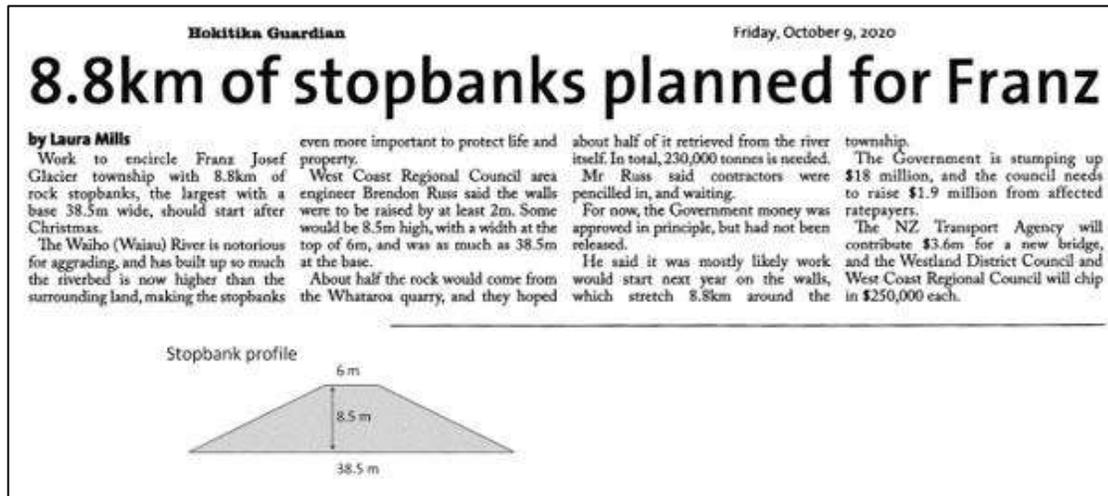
Information and cross-section of planned stopbanks (Hokitika Guardian, 2020)
